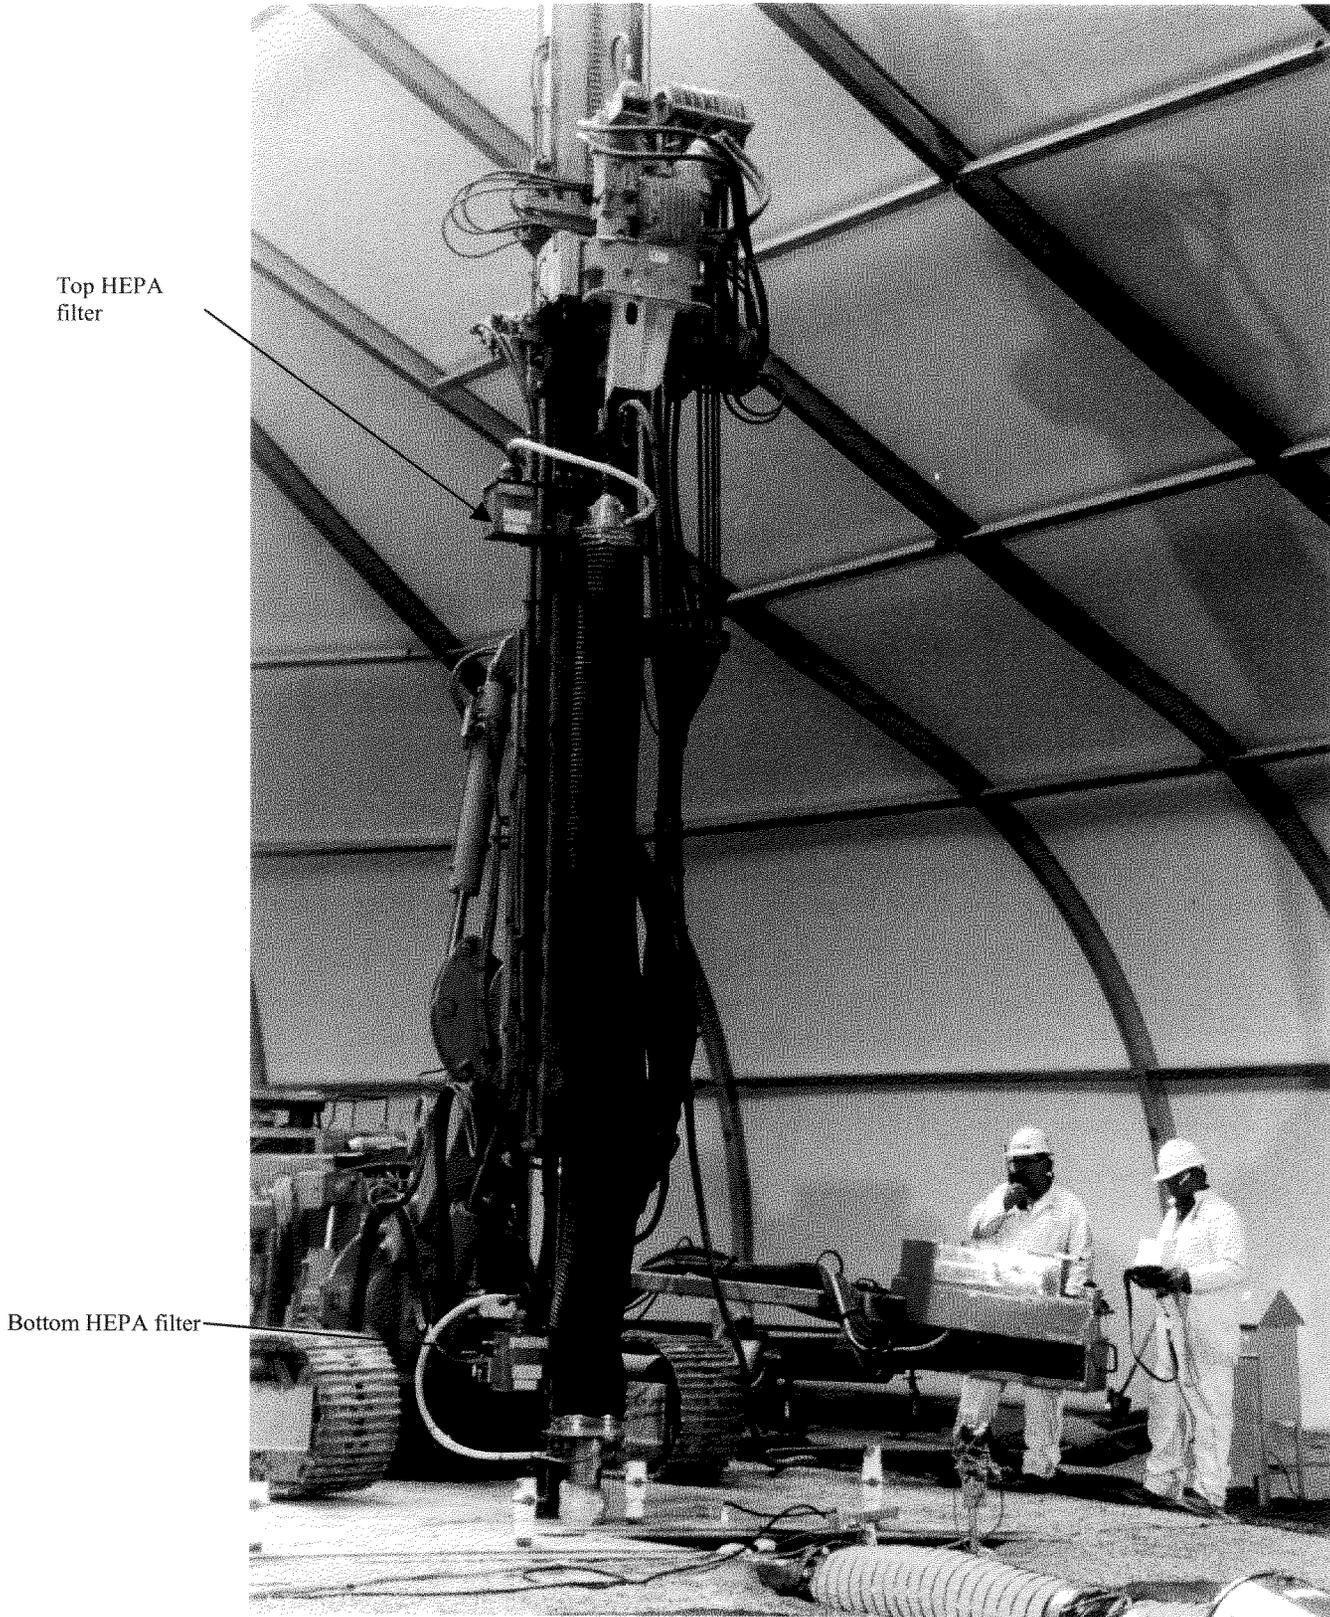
Drill string being inserted into waste pit (Photo PN01-520-4-22).
